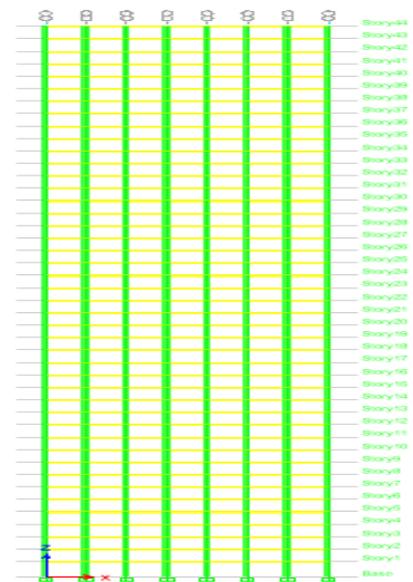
SECTIONAL ELEVATION OF BUILDING MODEL 1(WITHOUT OUTRIGGER)
